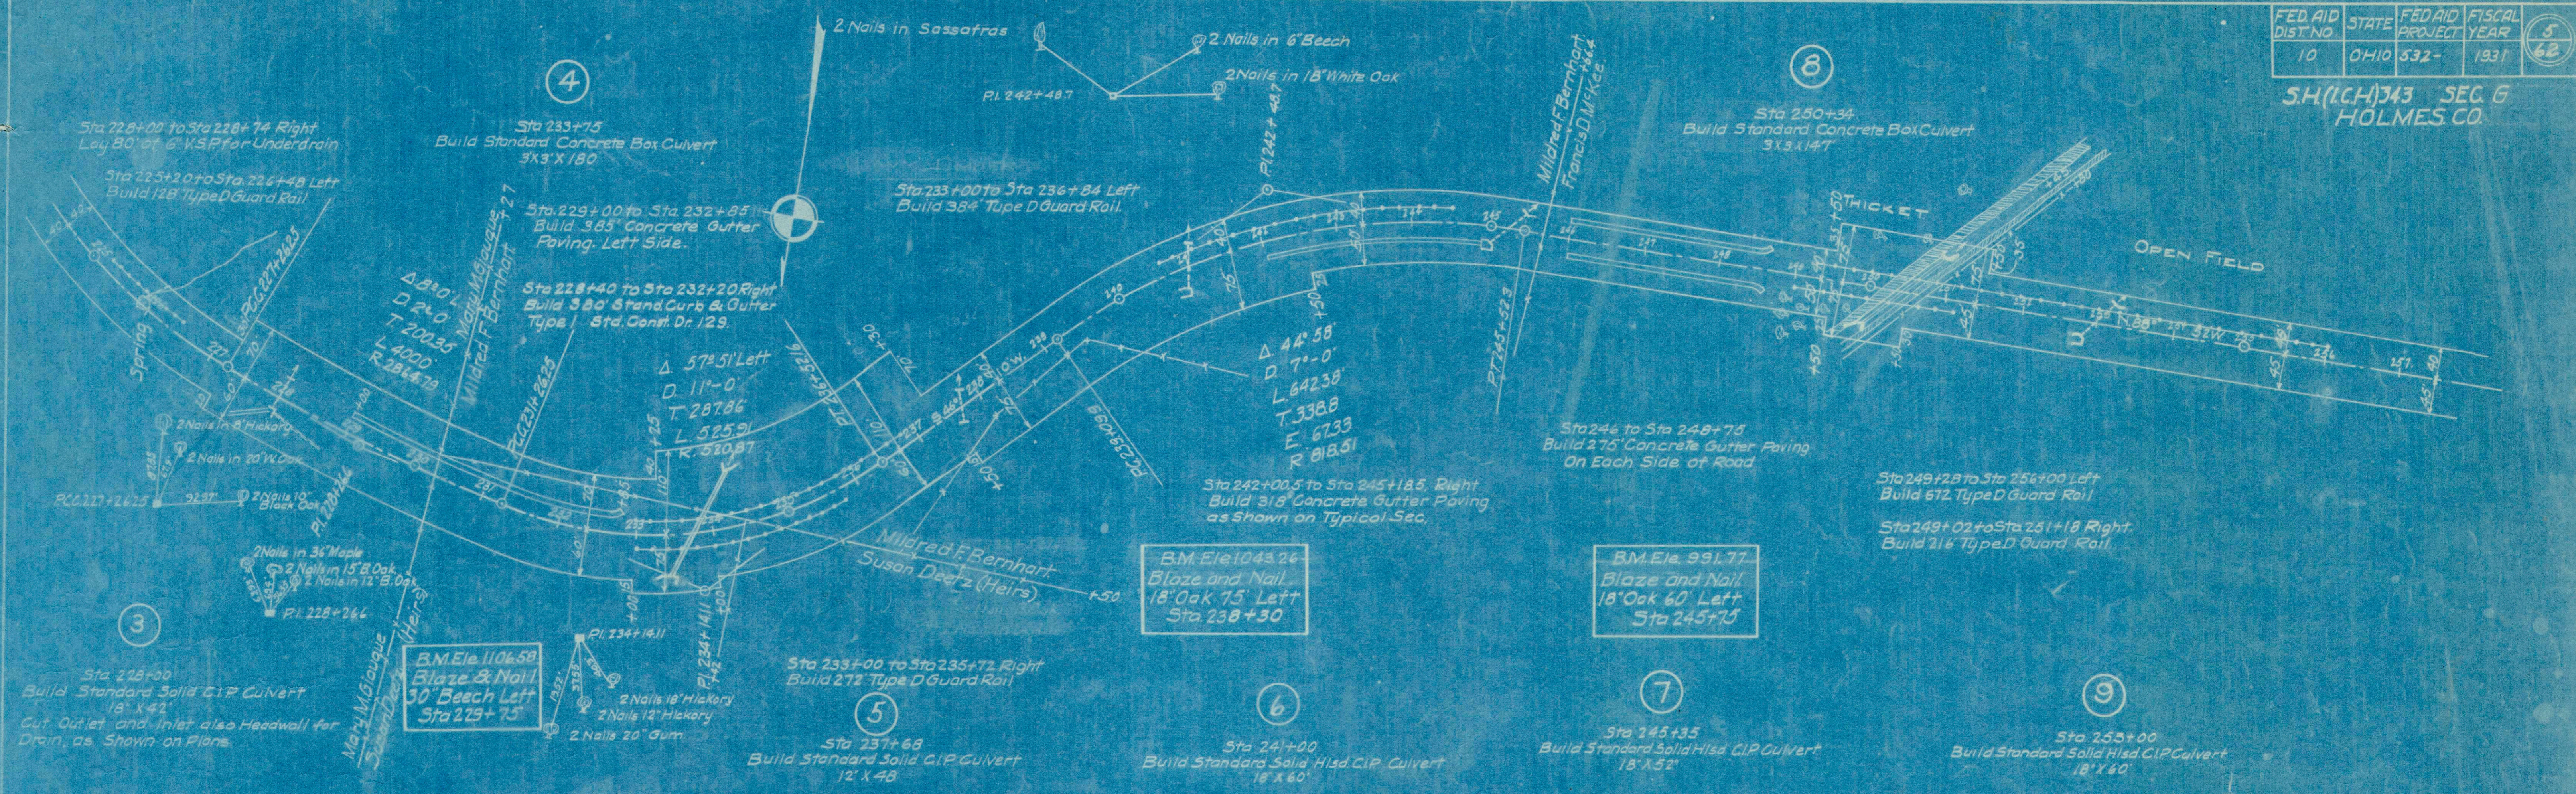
PLAN - PROFILE OF F.R.R.E. STATIONED
